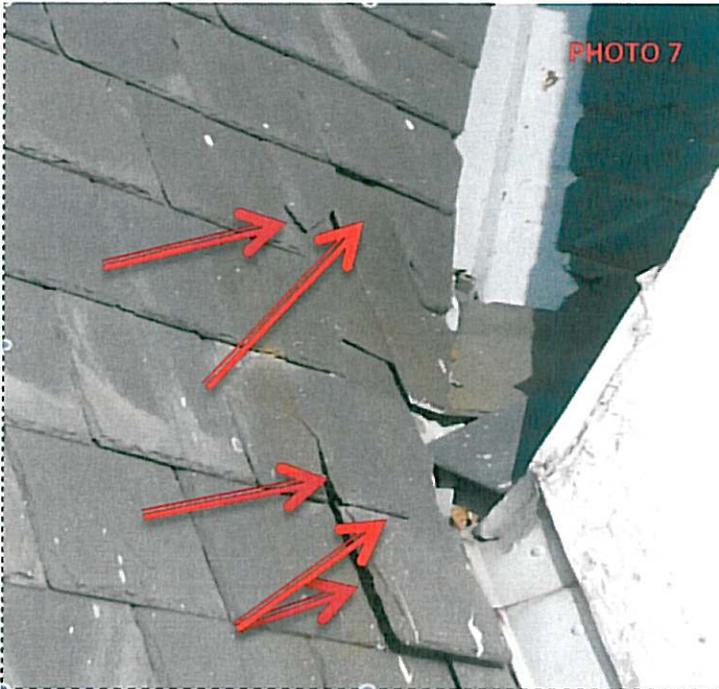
Close up of missing, cracked and over-nailed slate condition.
